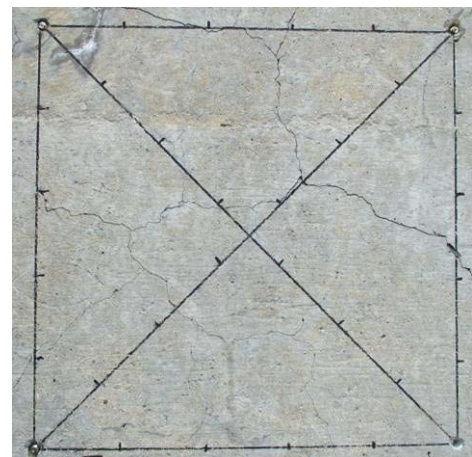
Examples of crack map sections for exposed and non-exposed sections of the bridge abutment walls.
